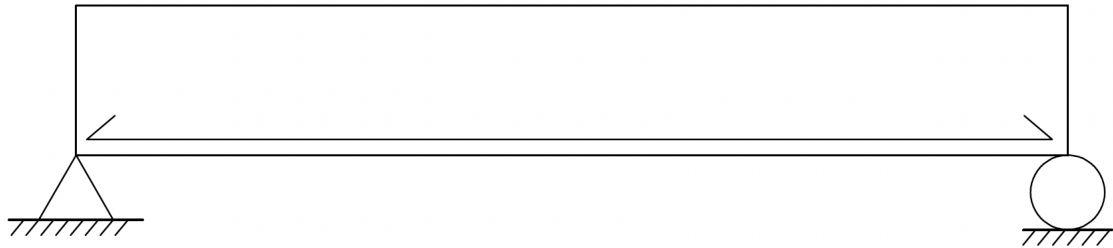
Schematic illustration of the single span slab model used in the slab parameter study, showing the assumed simple support condition and the reinforcement considered in the field section.
